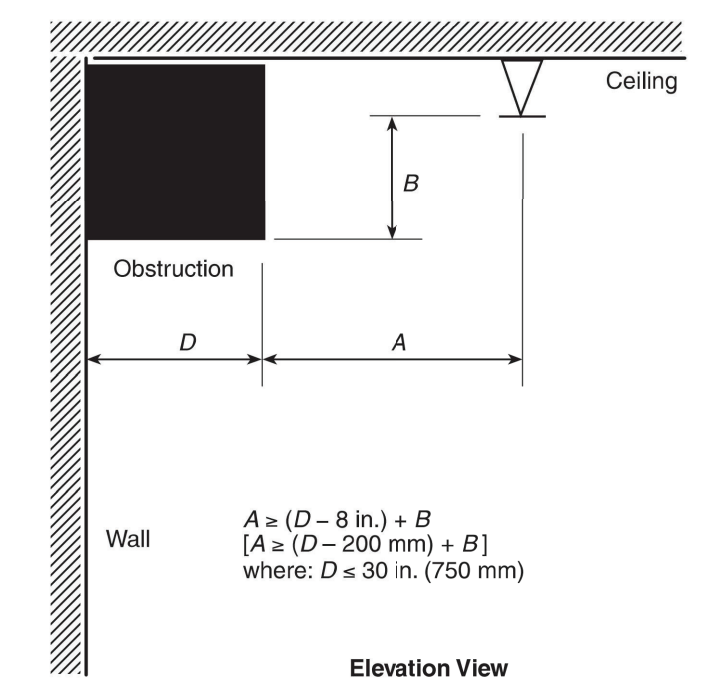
(b) Obstruction Against Wall (SSU/SSP).
